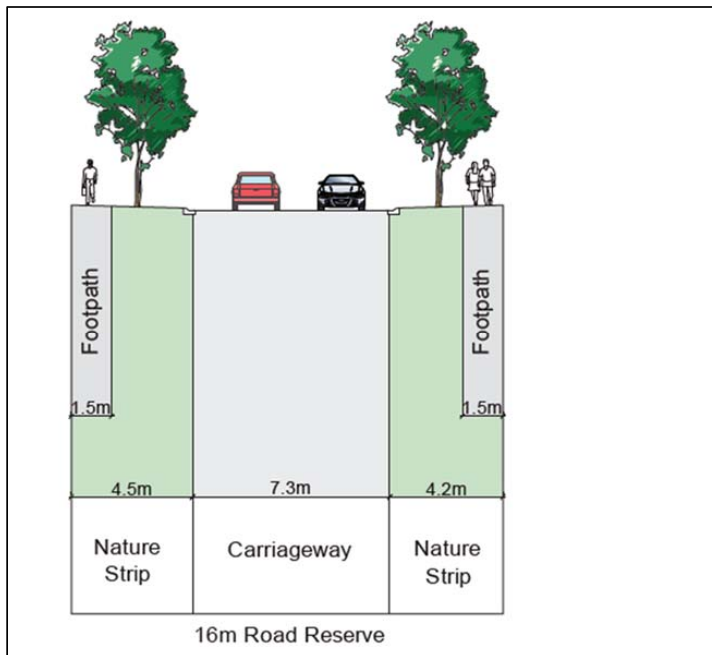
TYPICAL SECTION ACCESS STREET LEVEL 1
